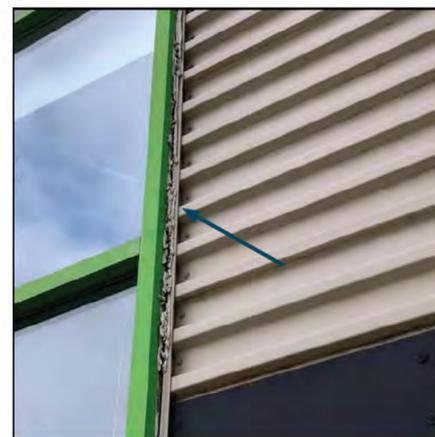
Sealant at Curtain Wall to Metal Cladding Interface, Linking Building
